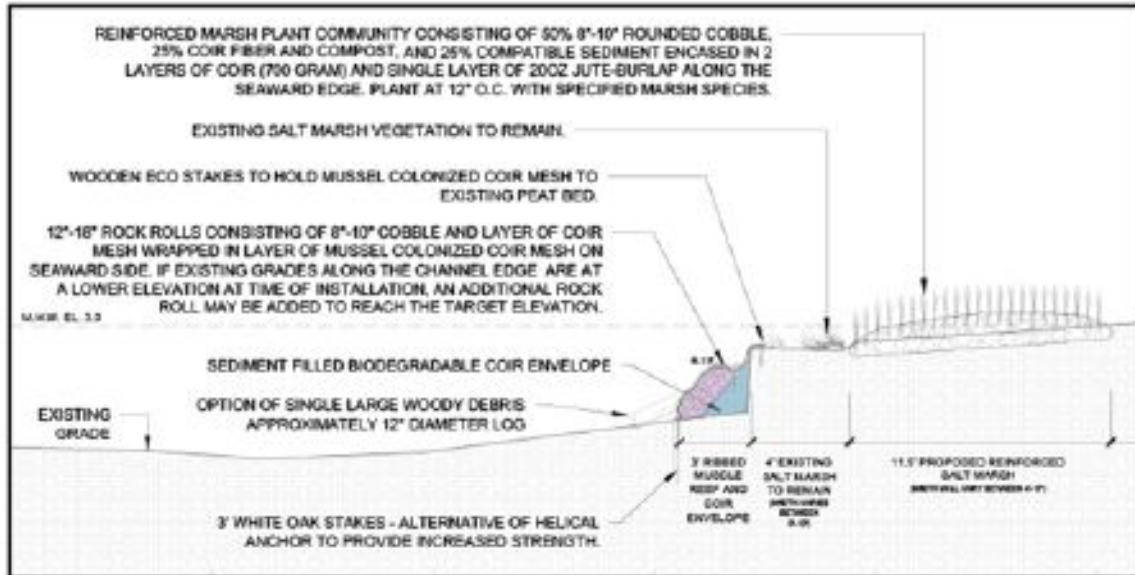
Proposed Section – Reinforced salt marsh with ribbed mussel reef and sediment filled coir envelope. Coir envelope installation is shown in blue and rock roll installation is shown in purple.
